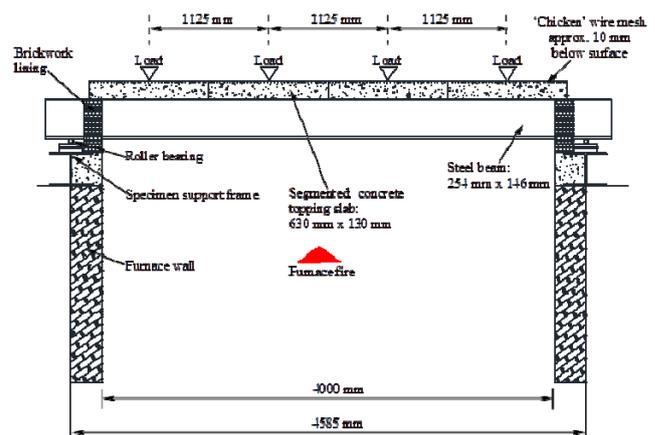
Longitudinal section for the simply supported floor beam test 2 assembly [16]
